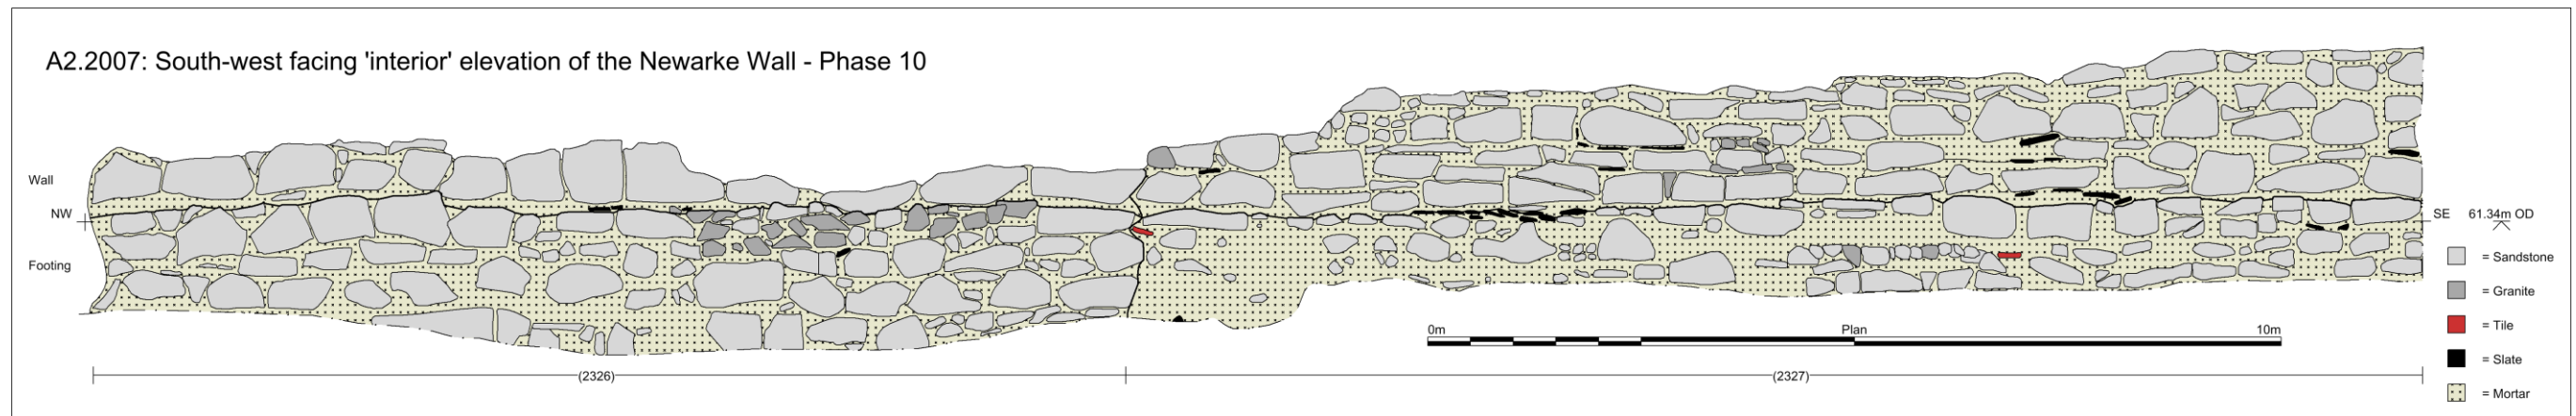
Elevation of the Newarke Wall – A2.2007, Trench 3
